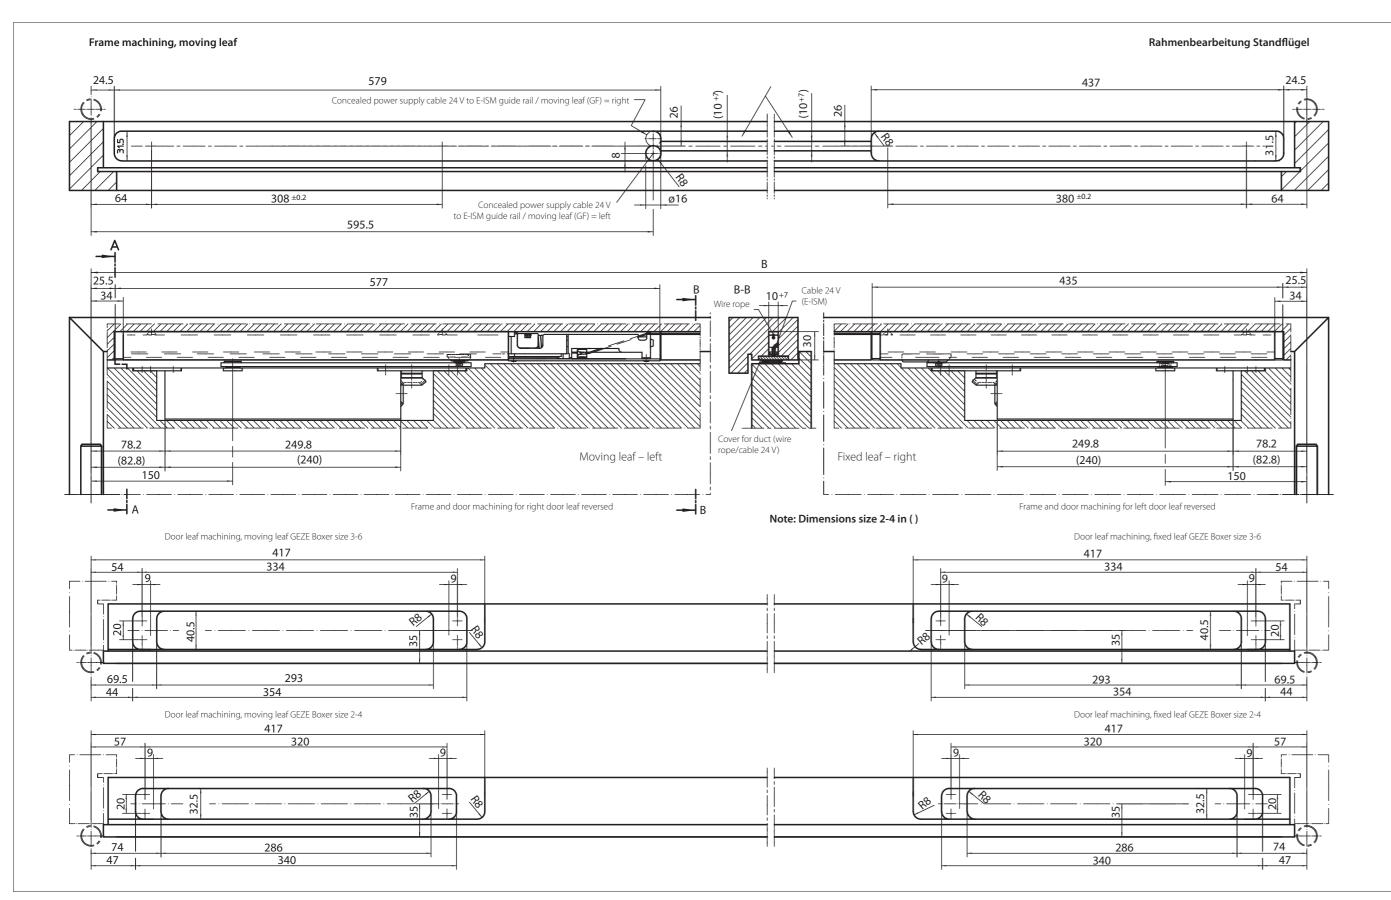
· ISM/E-ISM guide rail Boxer door leaf width 1130-1300 mm, rebated timber door
